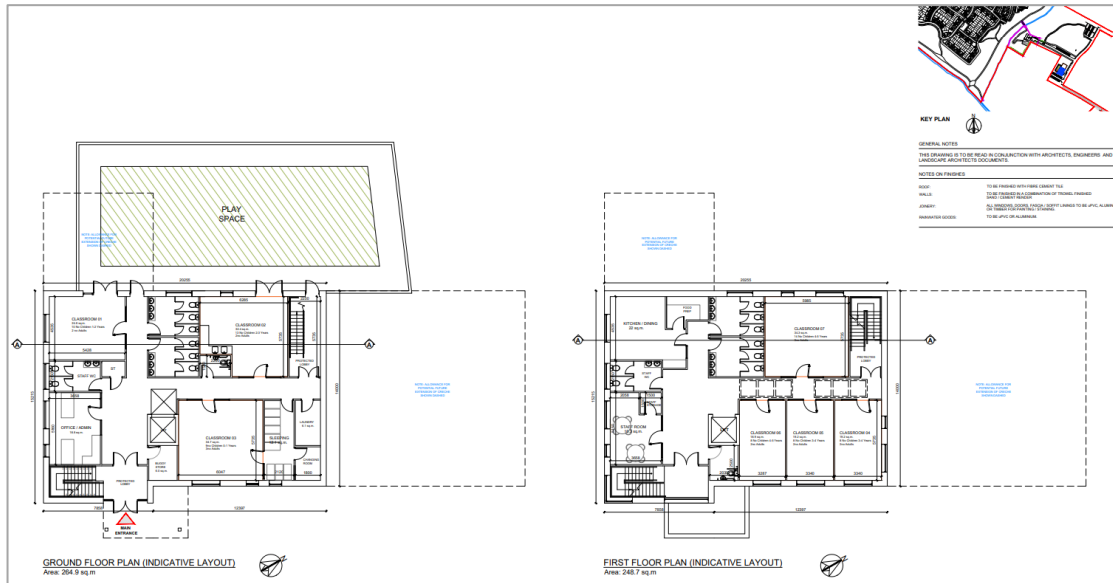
Creche Floor Plan (Source MCORM dwg no. PL500)
